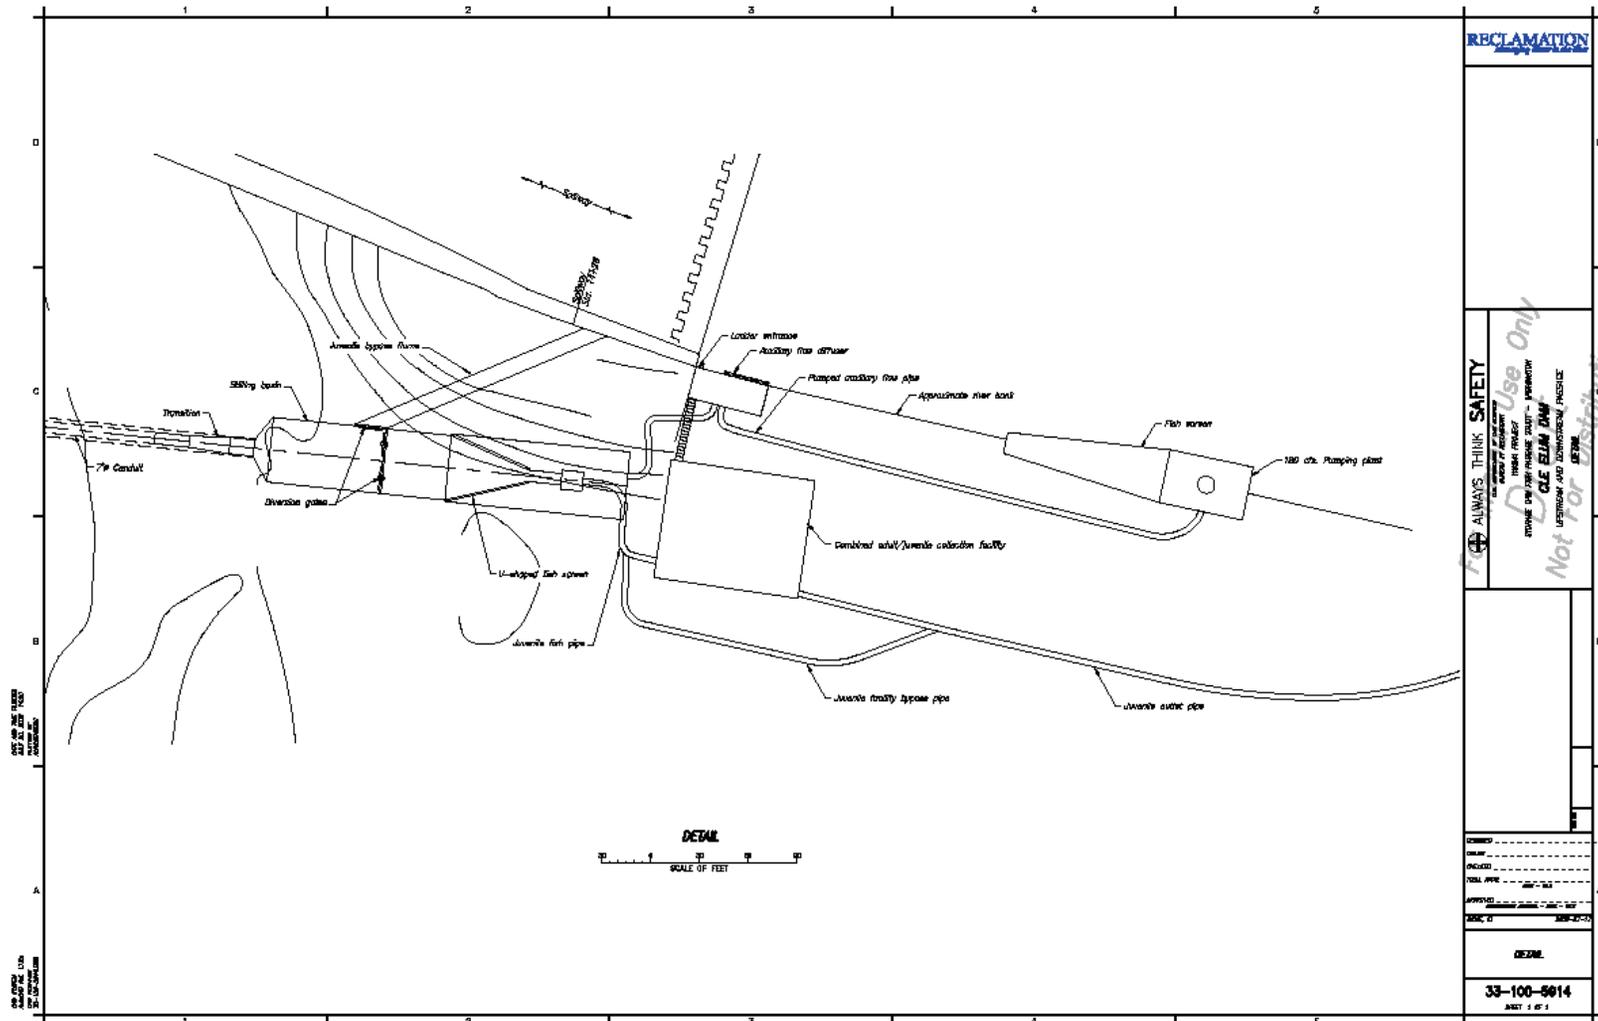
Preliminary rough layout of the VP proposal for the right bank upstream trap and haul facilities and downstream passage exit with juvenile tagging facility included.
